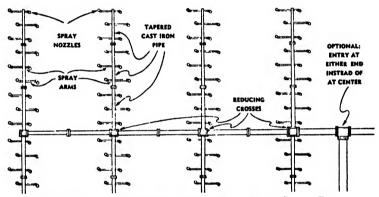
Typical Nozzle Arrangement for a Spray Pond
